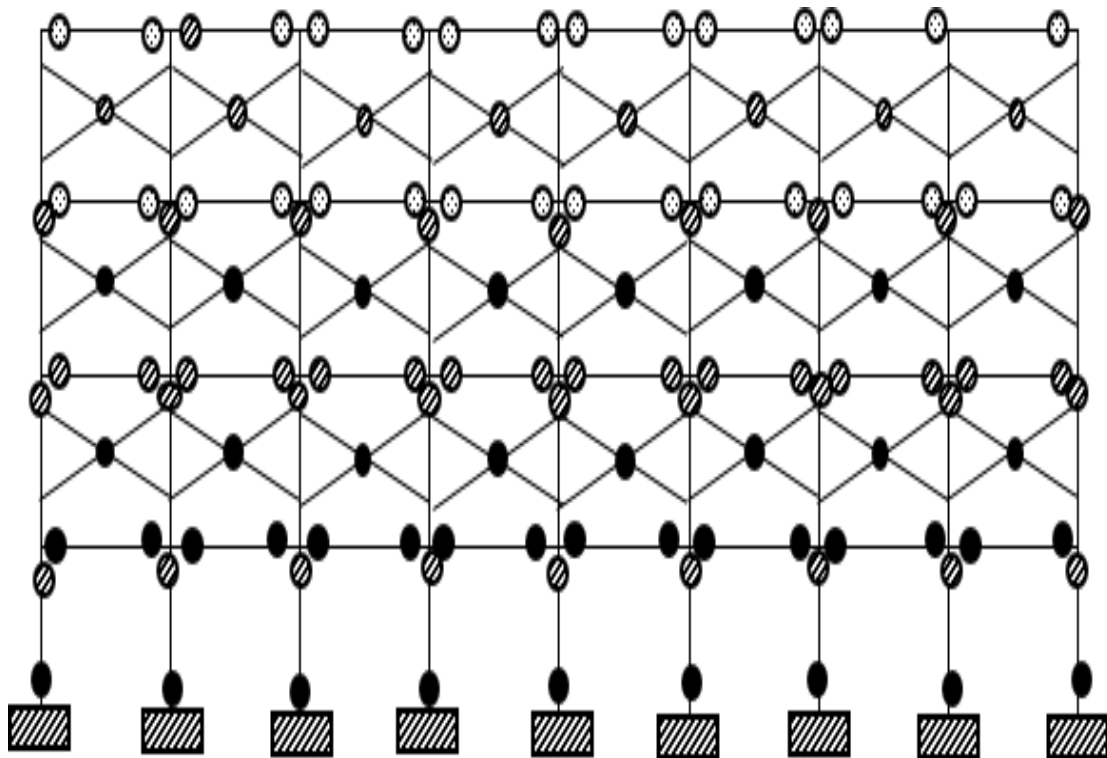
Collapse mechanism at the critical frame of POGS building
